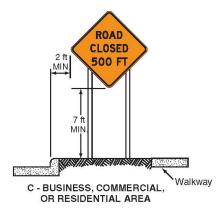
F-1. Height and Lateral Location of Signs—Typical Installations
